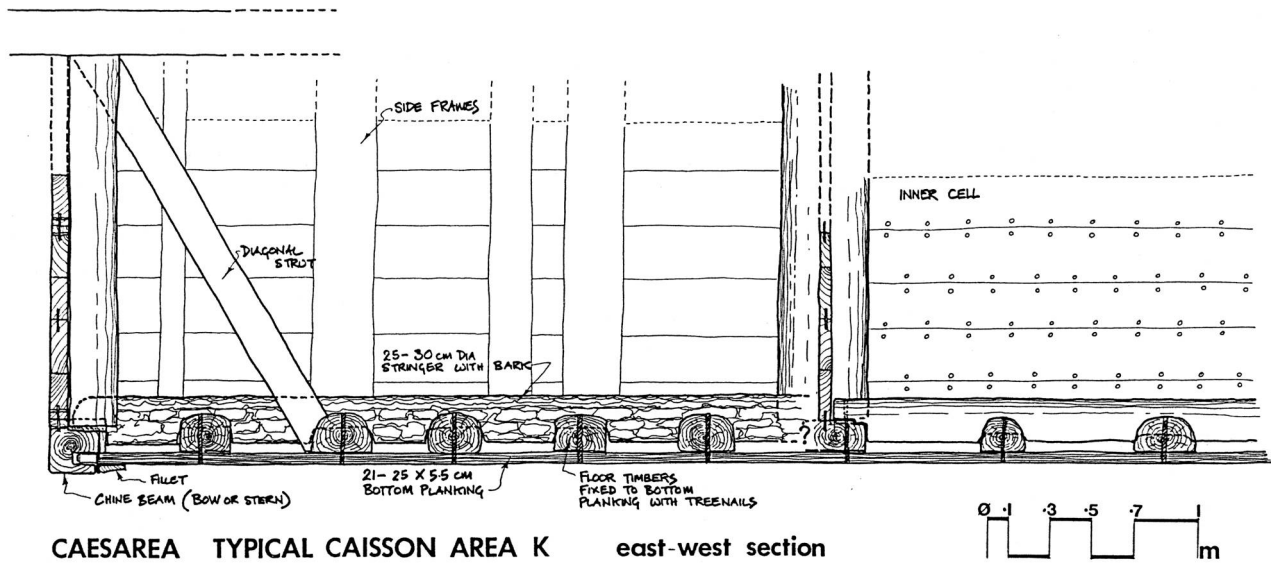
E-W section of caisson K2 (Drawing: C. Brandon)
